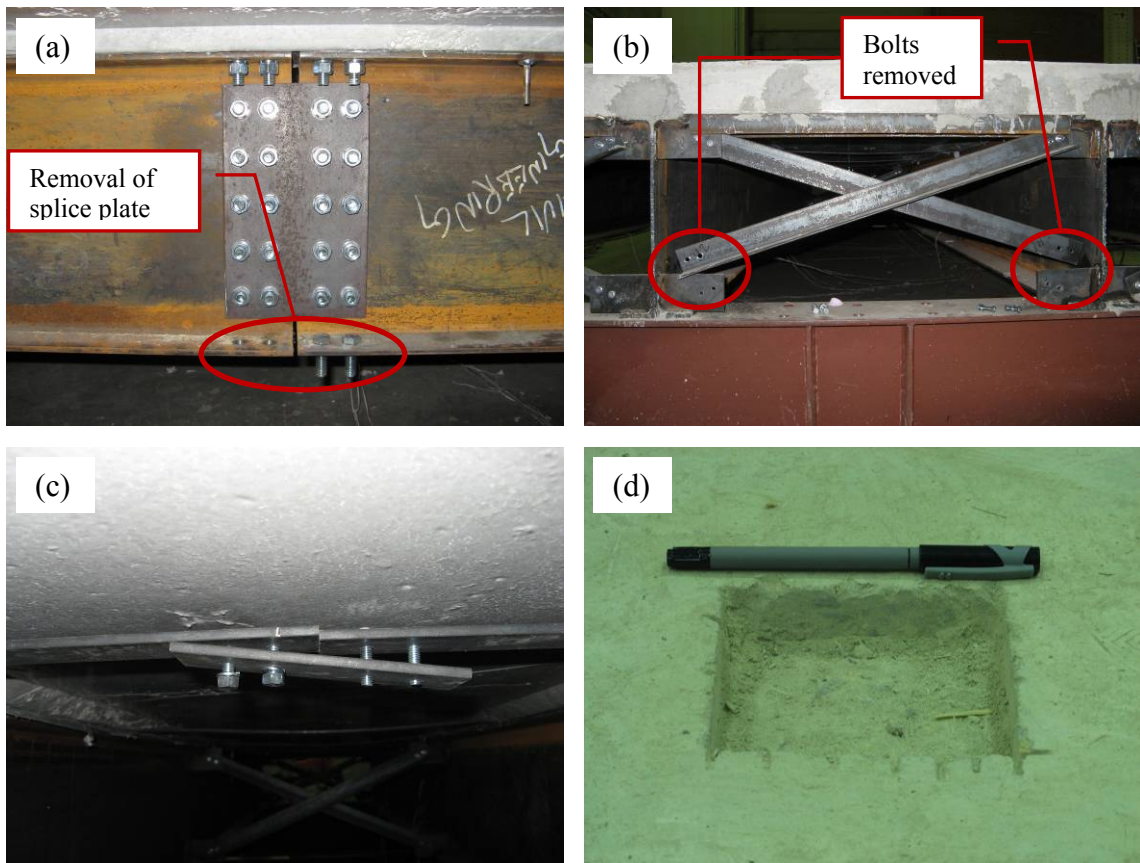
Damage states introduced to (a) the steel girders, (b) the diaphragm members, (c) the lateral steel straps, and (d) the concrete deck of the bridge model.
